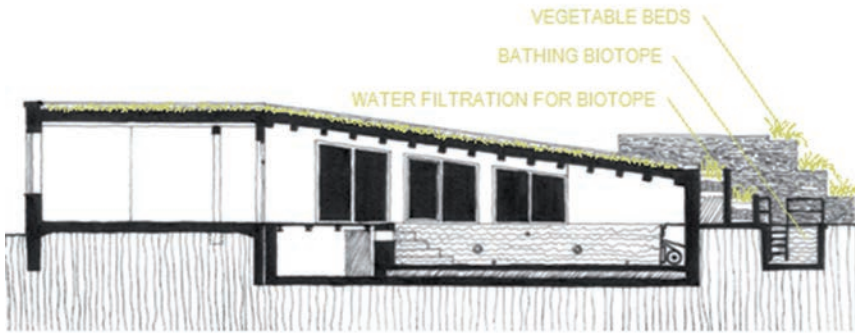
The cross section through the pool wing. Design and drawing: M. Nedvěď
